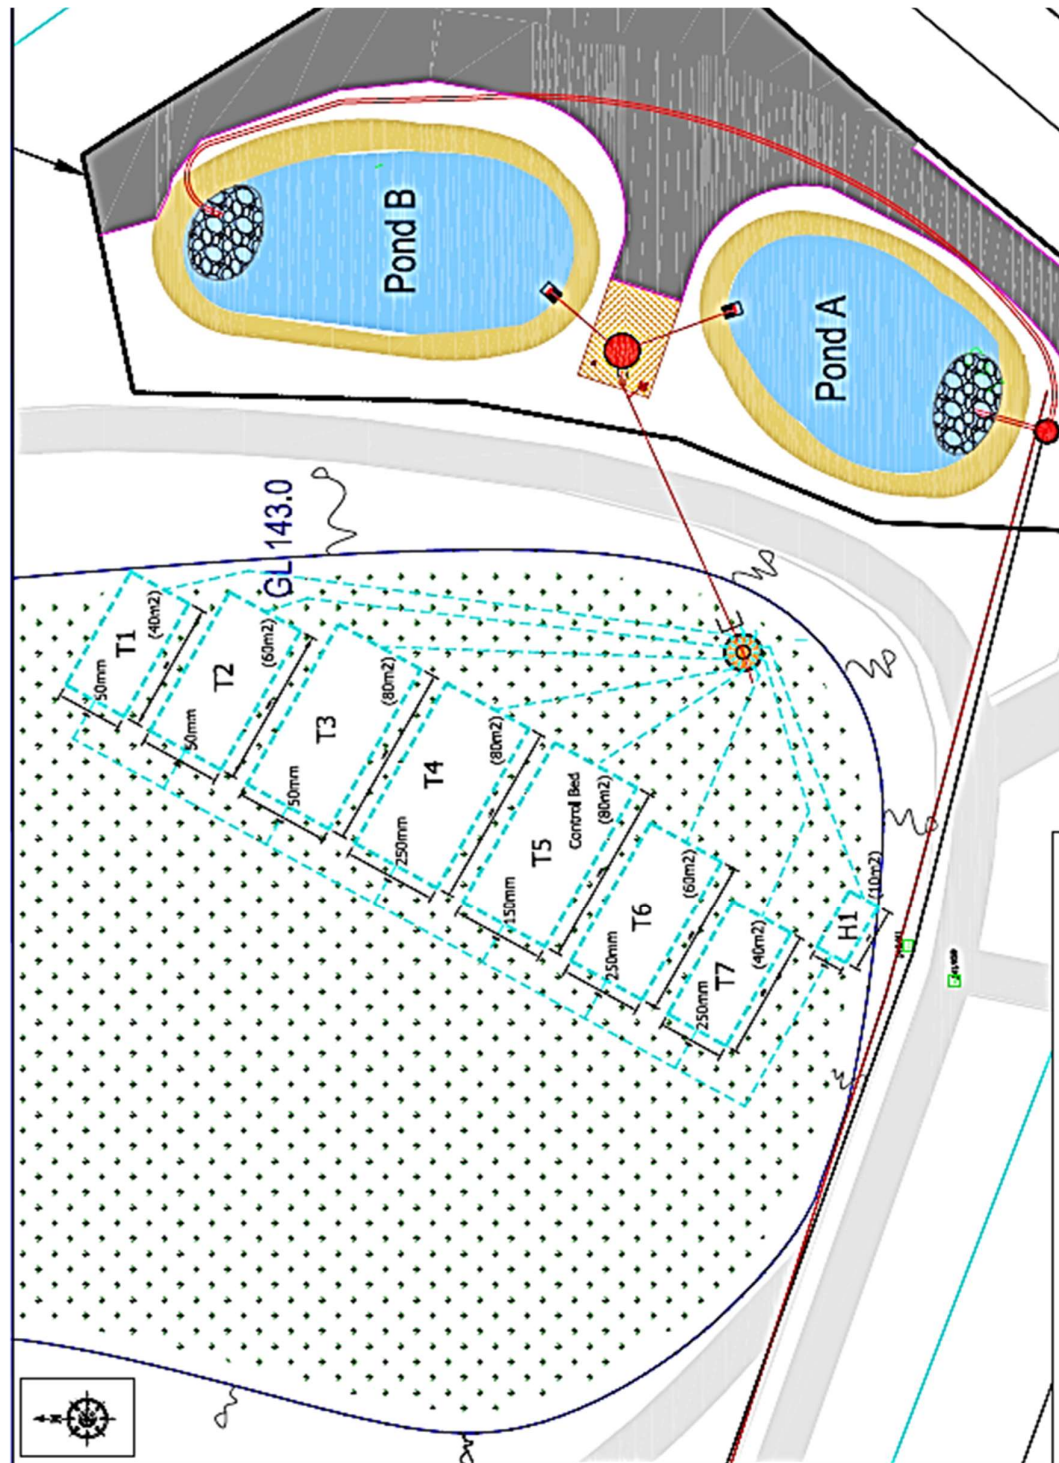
Proposed TR Layout within Pond 1 (Drawing by BSG Civil Engineering).
